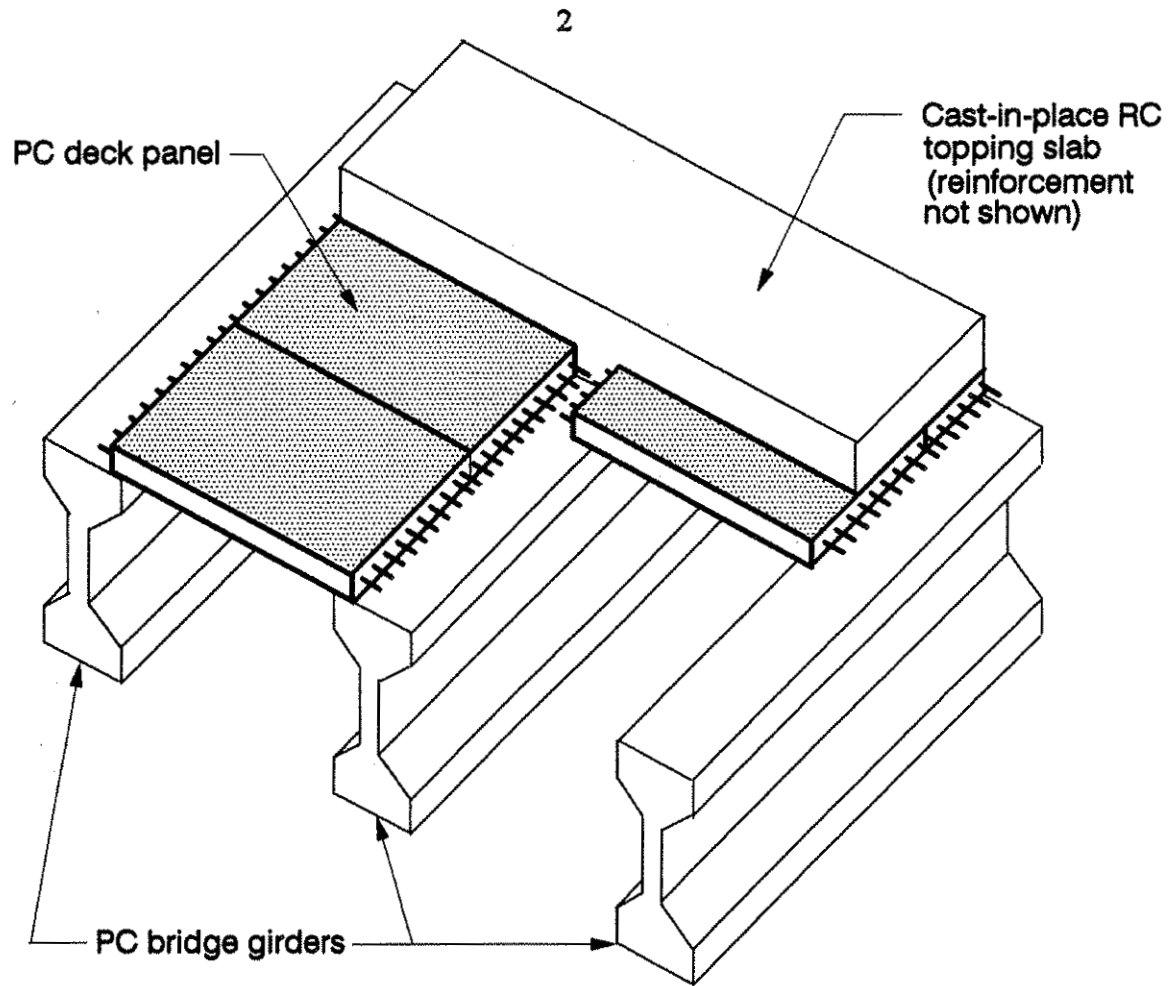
Isometric drawing showing PC bridge girders, PC deck panels, and cast-in-place RC topping slab
